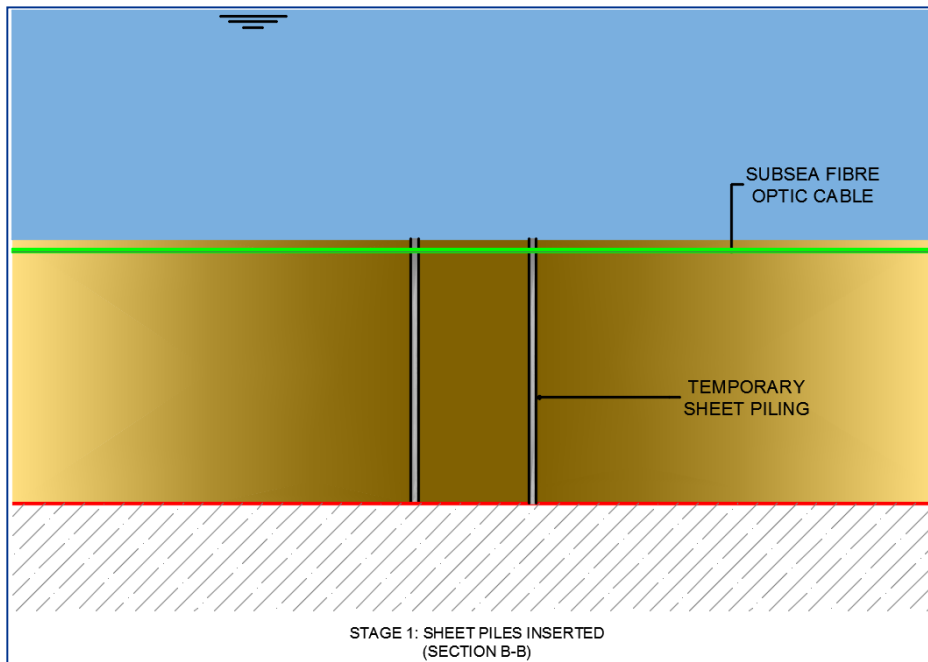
Fibre Optic Cable Crossing – Stage 1 – Install Sheet Piles
